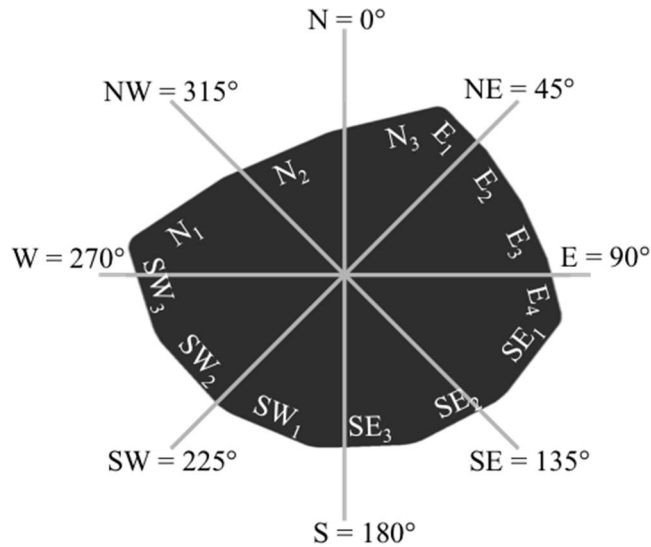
Kanyon floor plan and façade orientations pertaining to the measured wind directions.
